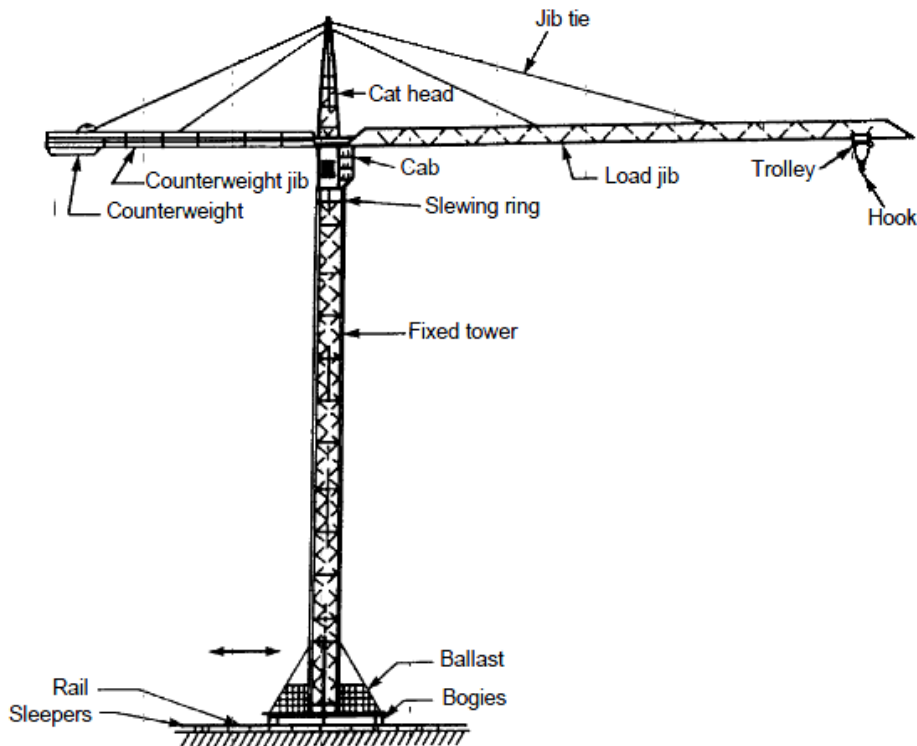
Illustration Shows Tower Crane (Source- NOAA)
